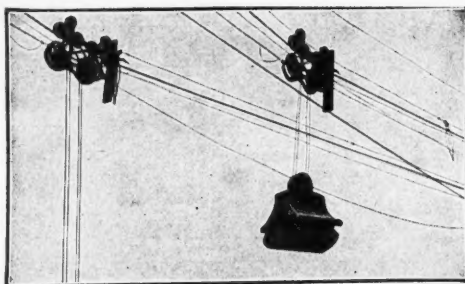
View of Carriage and Buckets Showing Fall Rope Carriers
